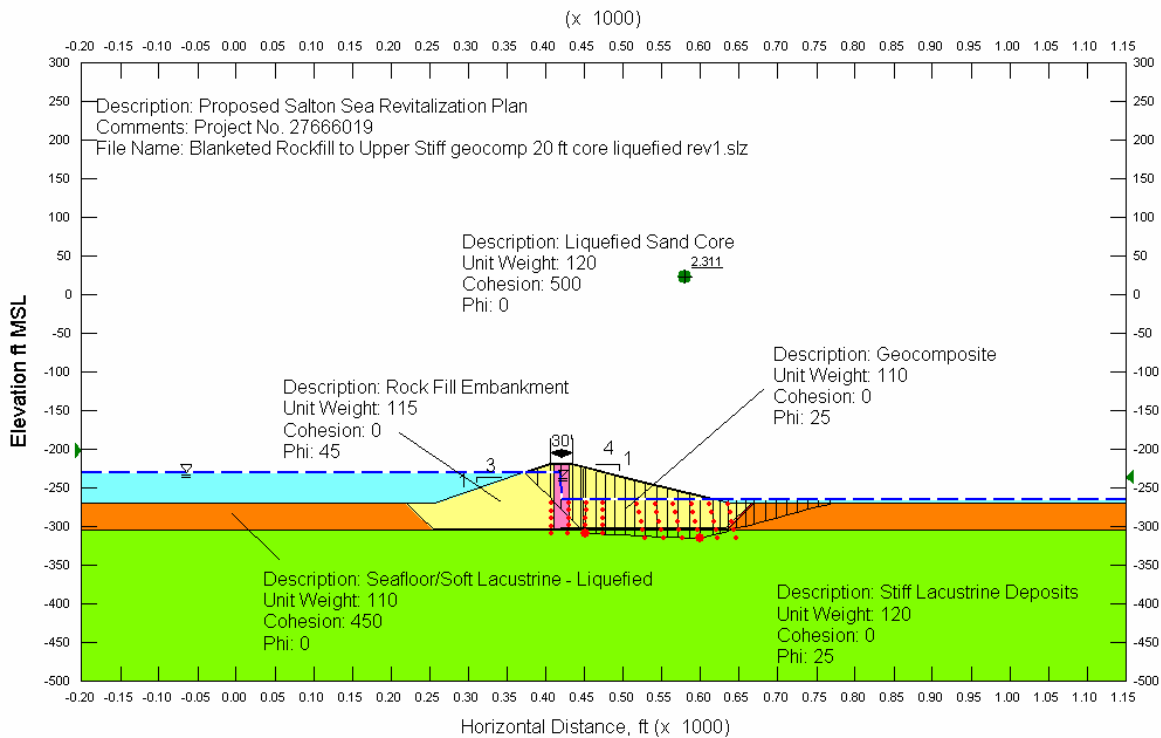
Typical cross-section of the SSA rockfill embankment.
